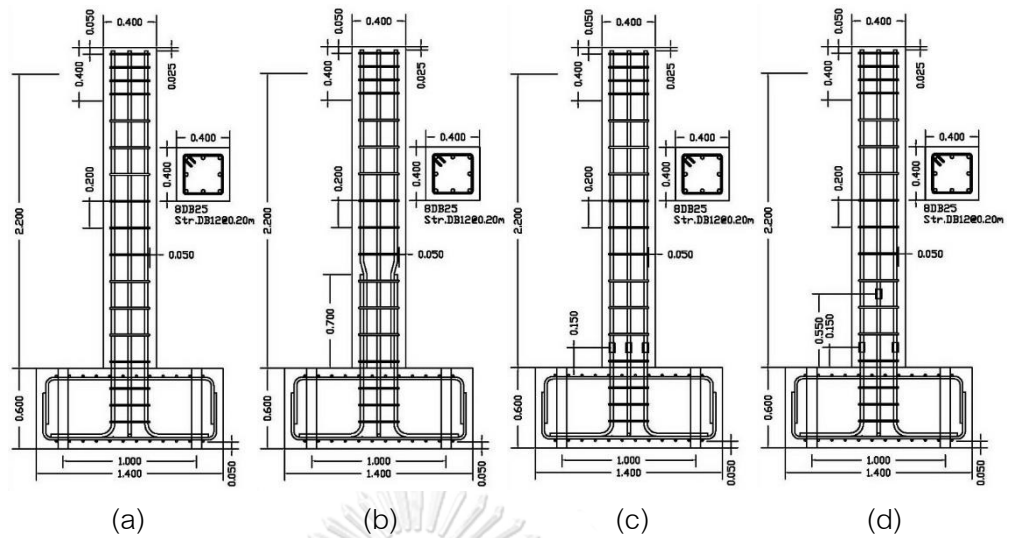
Column detailing of (a) NS, (b) LS, (c) MS1 and (d) MS2
